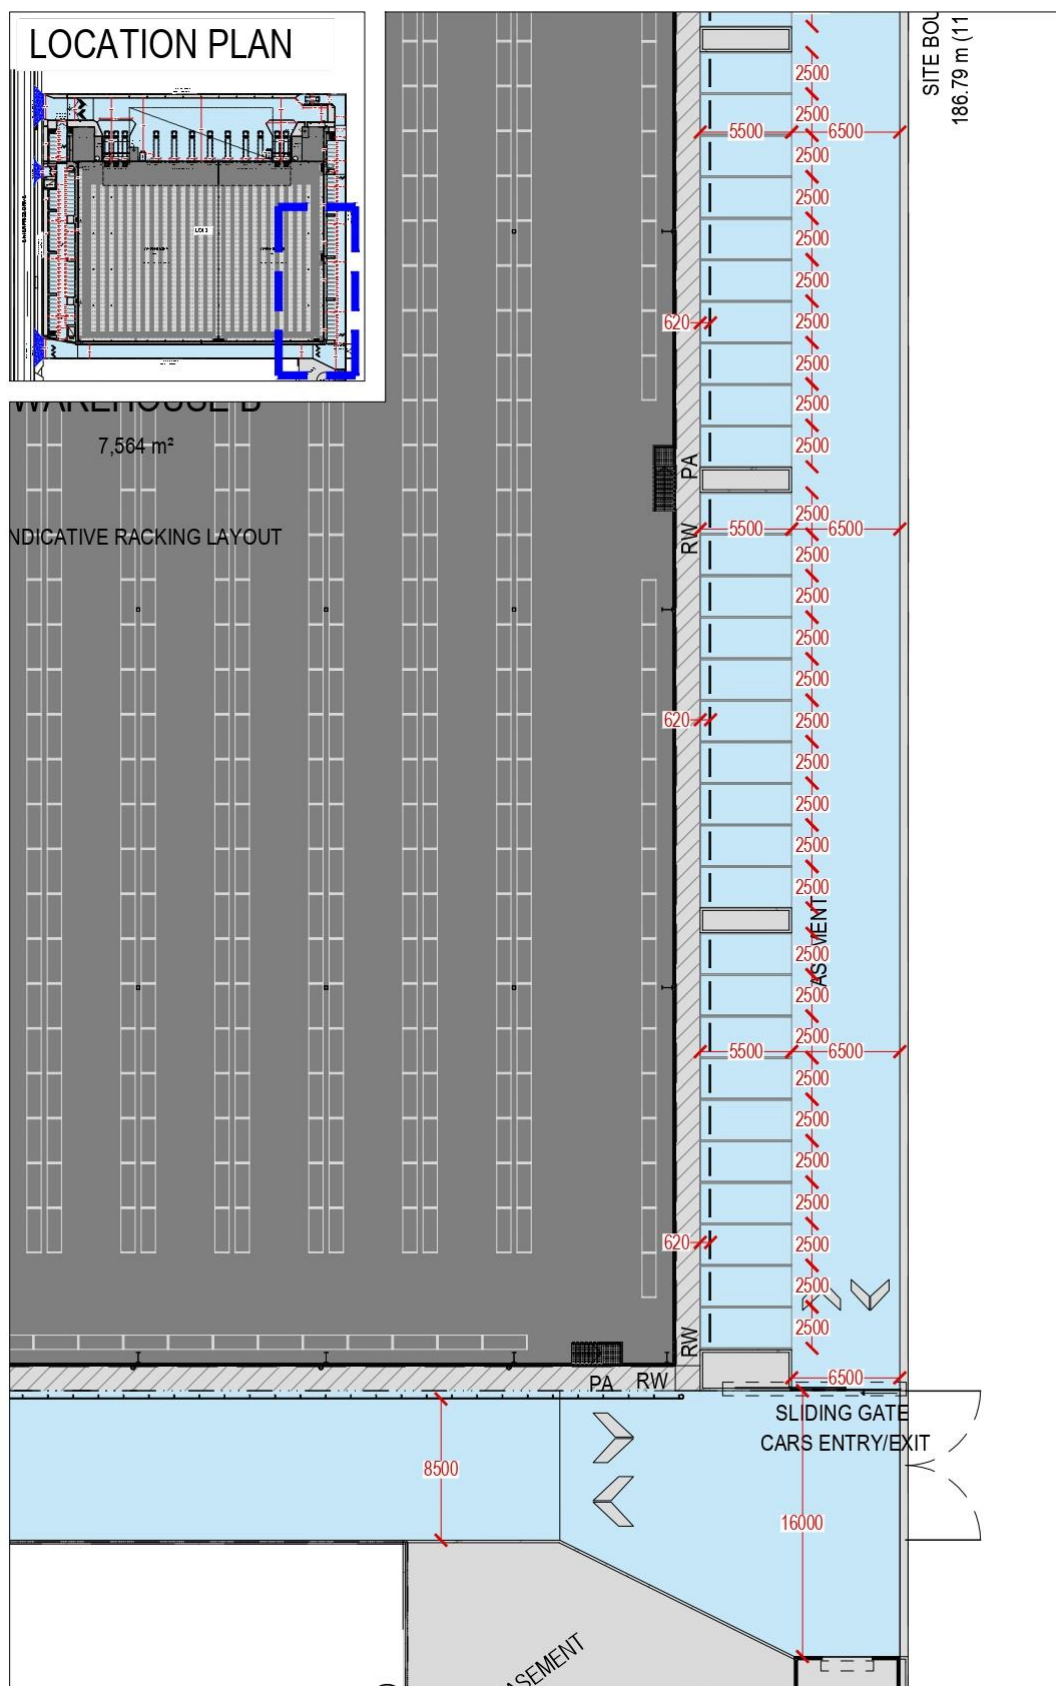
PROPOSED CAR PARKING LAYOUT AND DIMENSIONS
